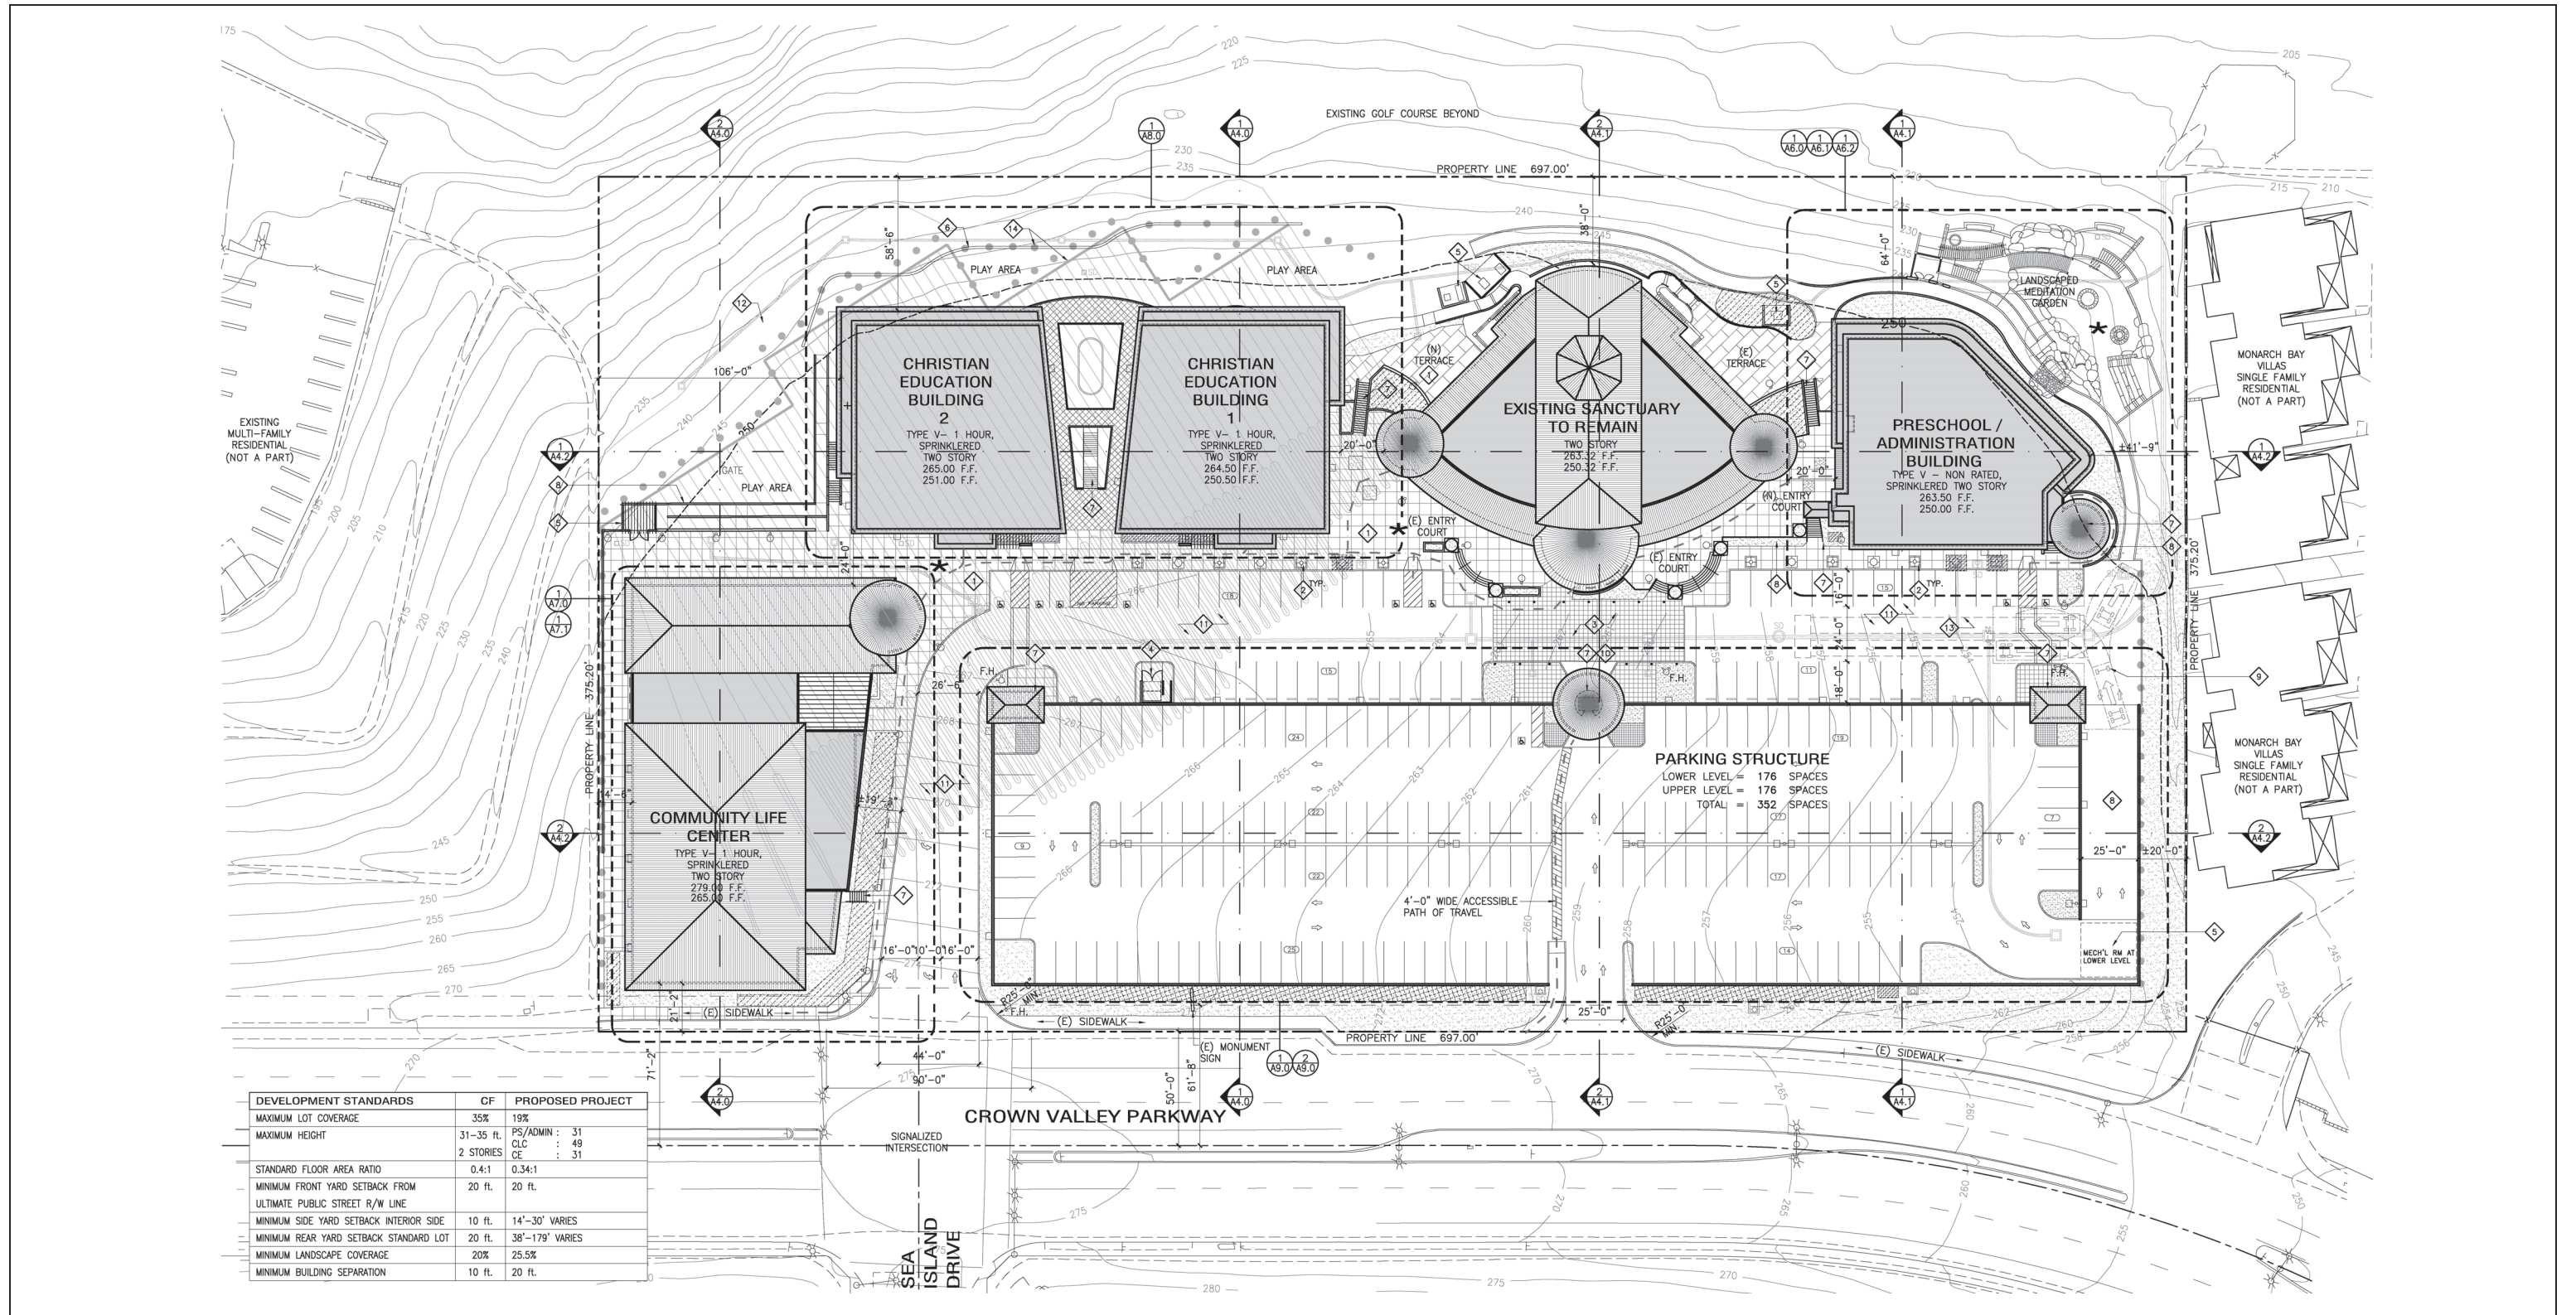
illustrates the project site plan. Access to the project site will continue to be provided at a full-access driveway (the east leg of the signalized intersection of Crown Valley Parkway/Sea Island Drive) and an unsignalized RIRO driveway along Crown Valley Parkway.
